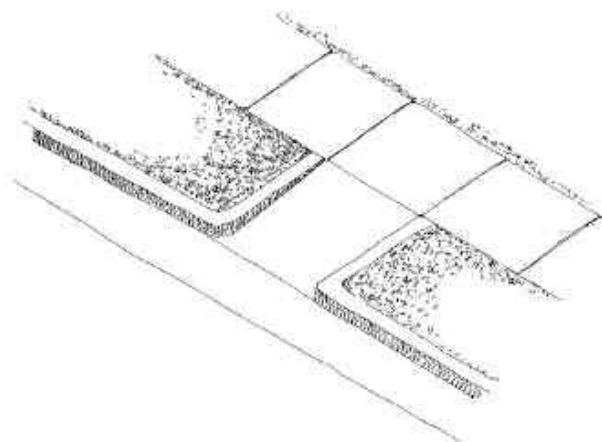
Returned curbs may be used when the curb ramp is located outside the pedestrian walkway, such as in a planting strip.
